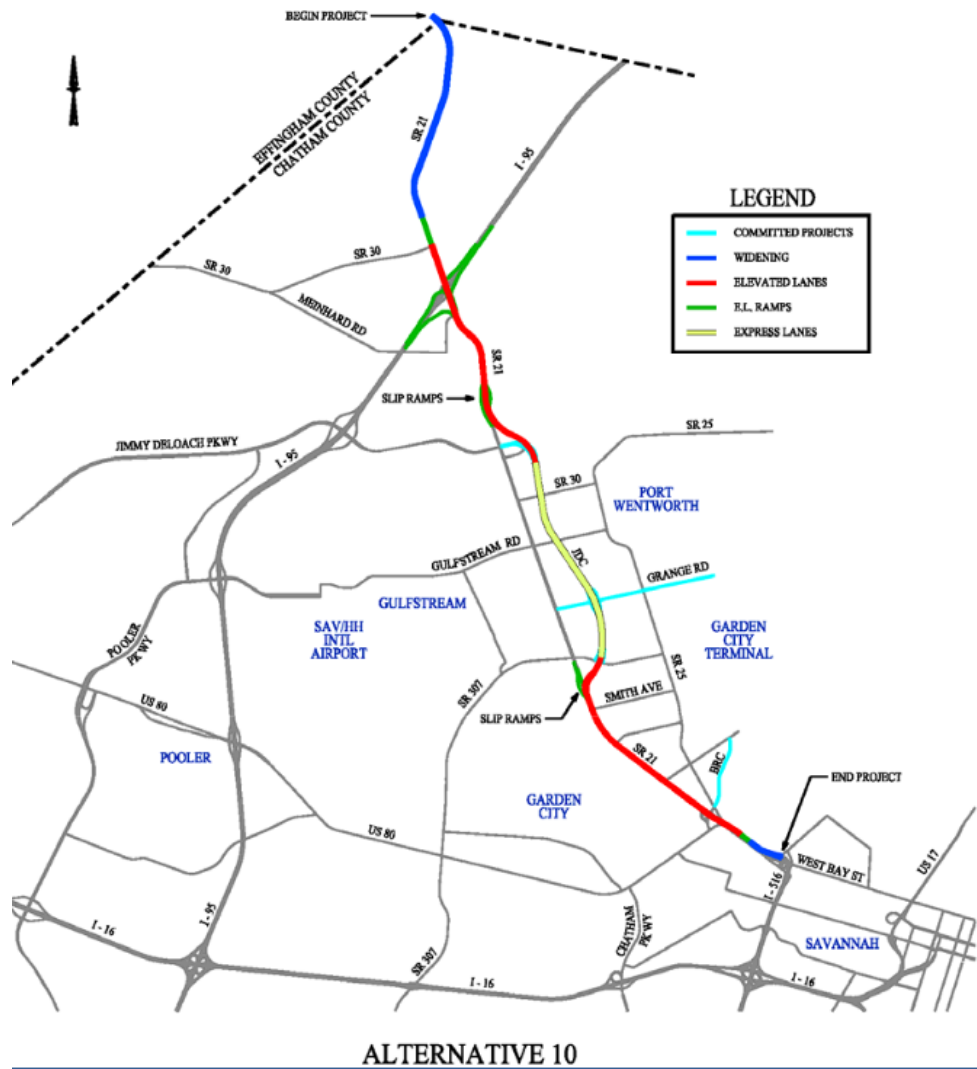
State Route 21 Proposed Improvement - Alternative 10
